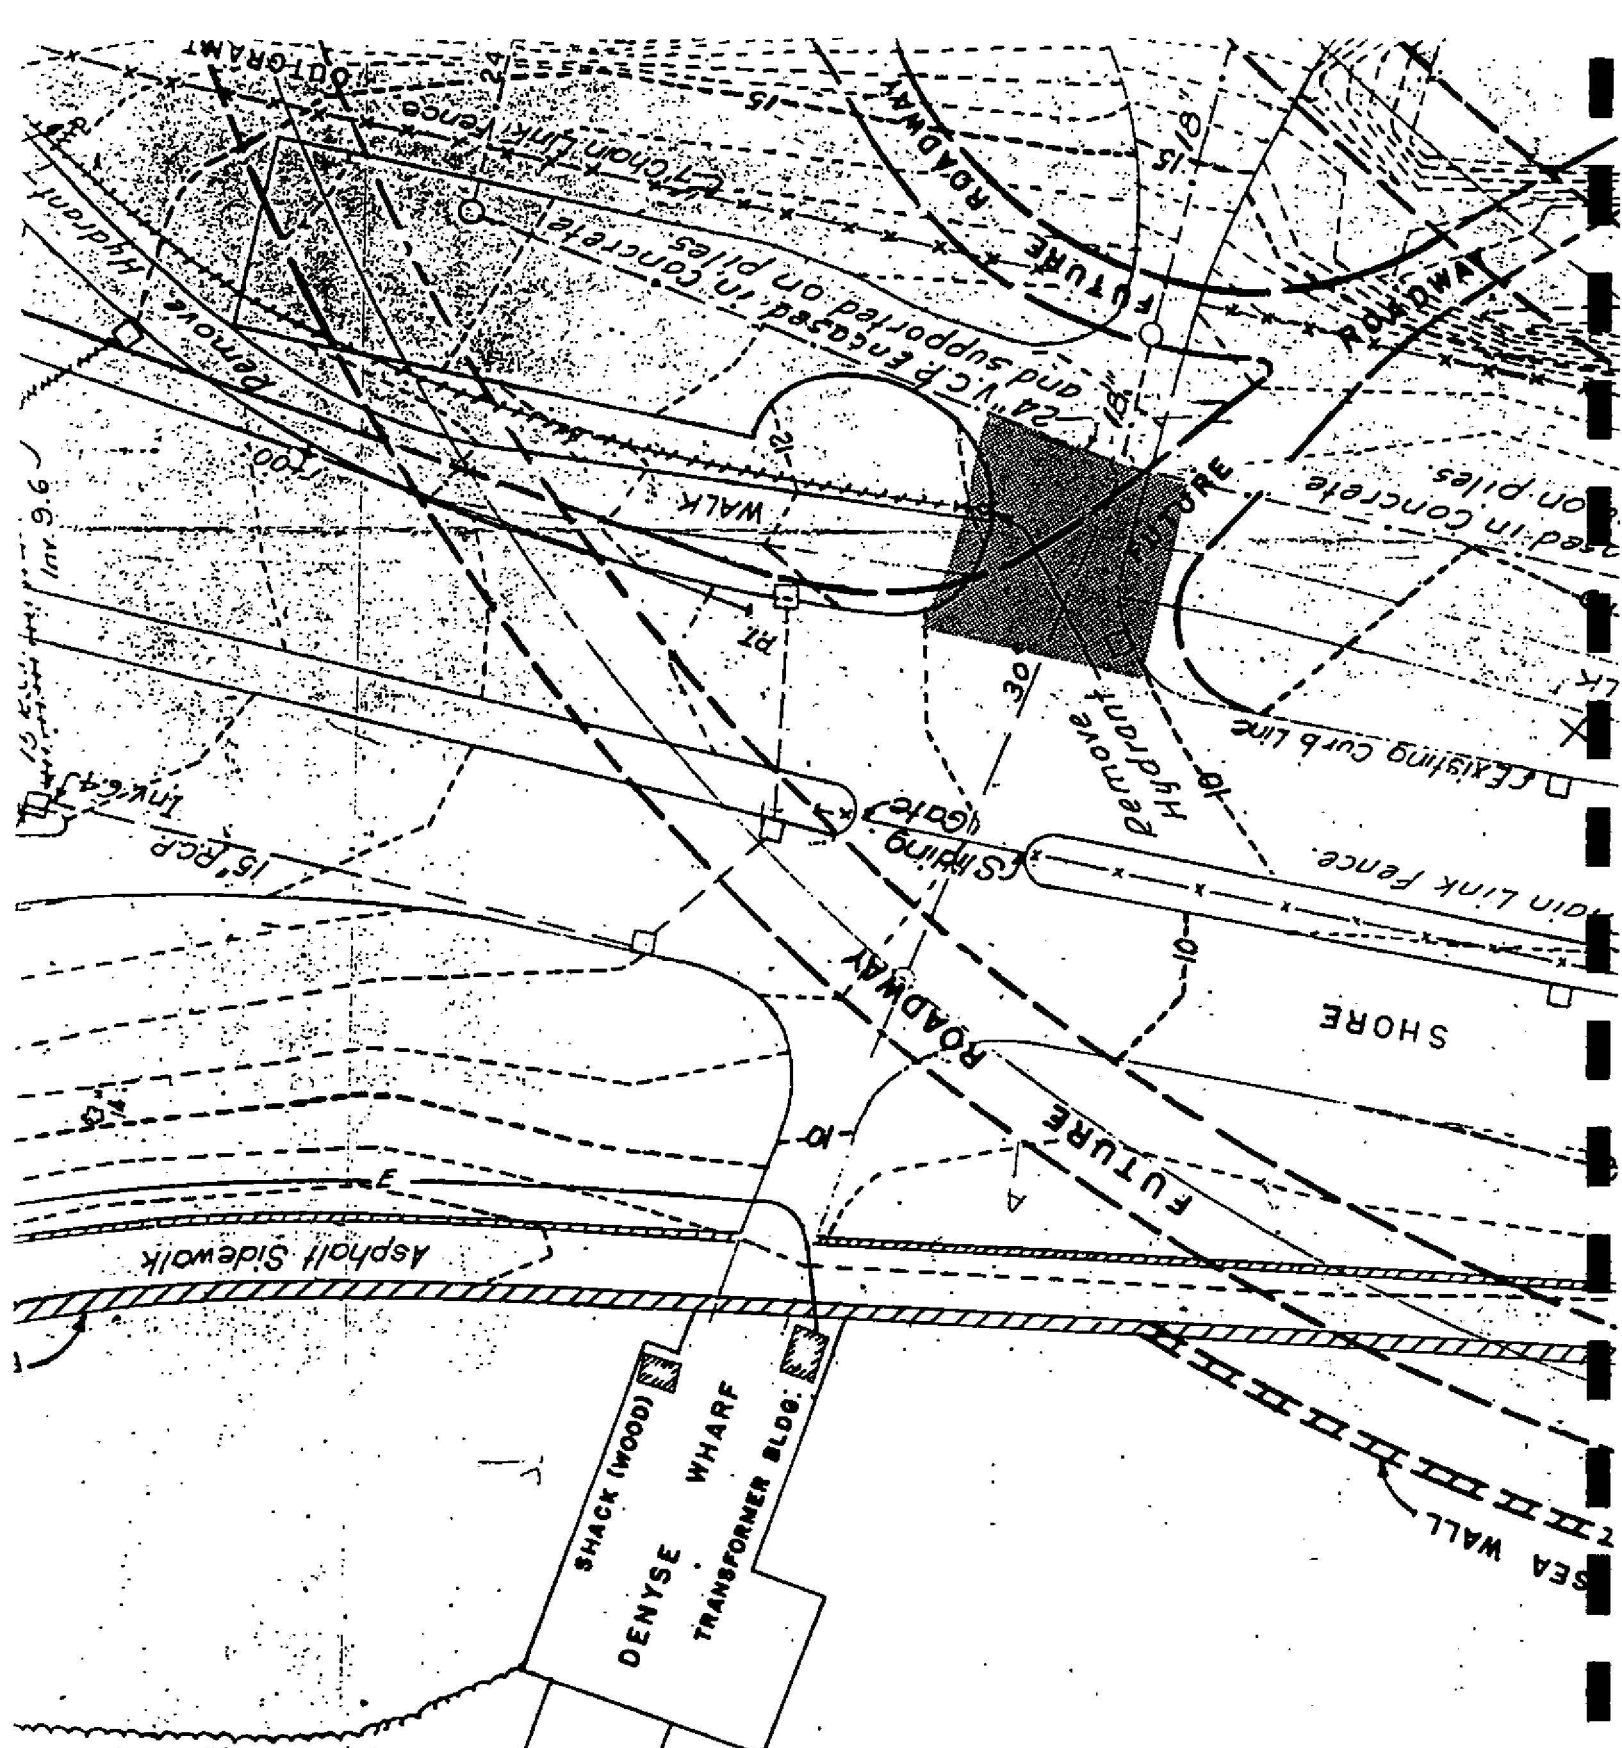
Grading and Drainage Plan, Brooklyn Anchorage, Narrows Bridge
